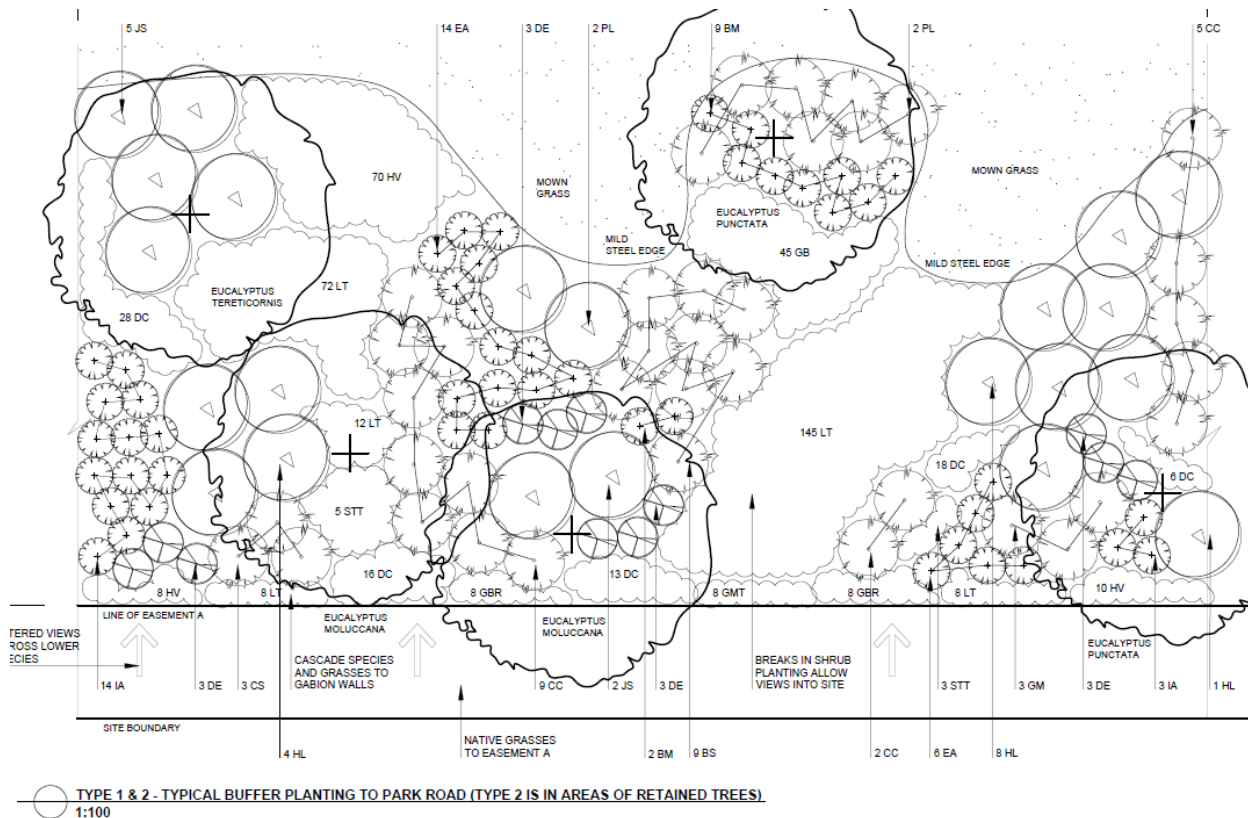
Excerpt from Vegetation Buffer Planting plan showing extent of proposed installation. (Botanica, March 2021).
